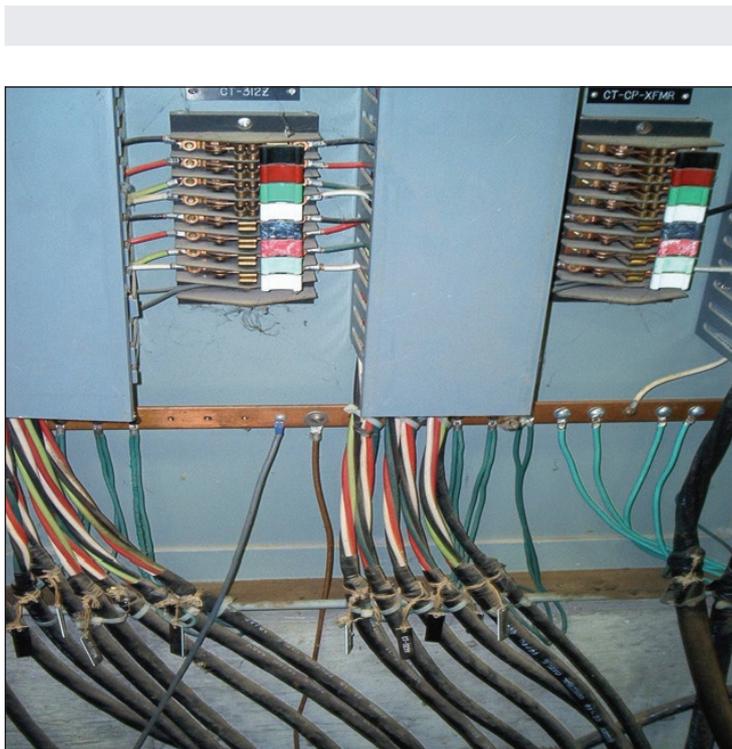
Typical cable grounding and junction box connections inside of a control house.
